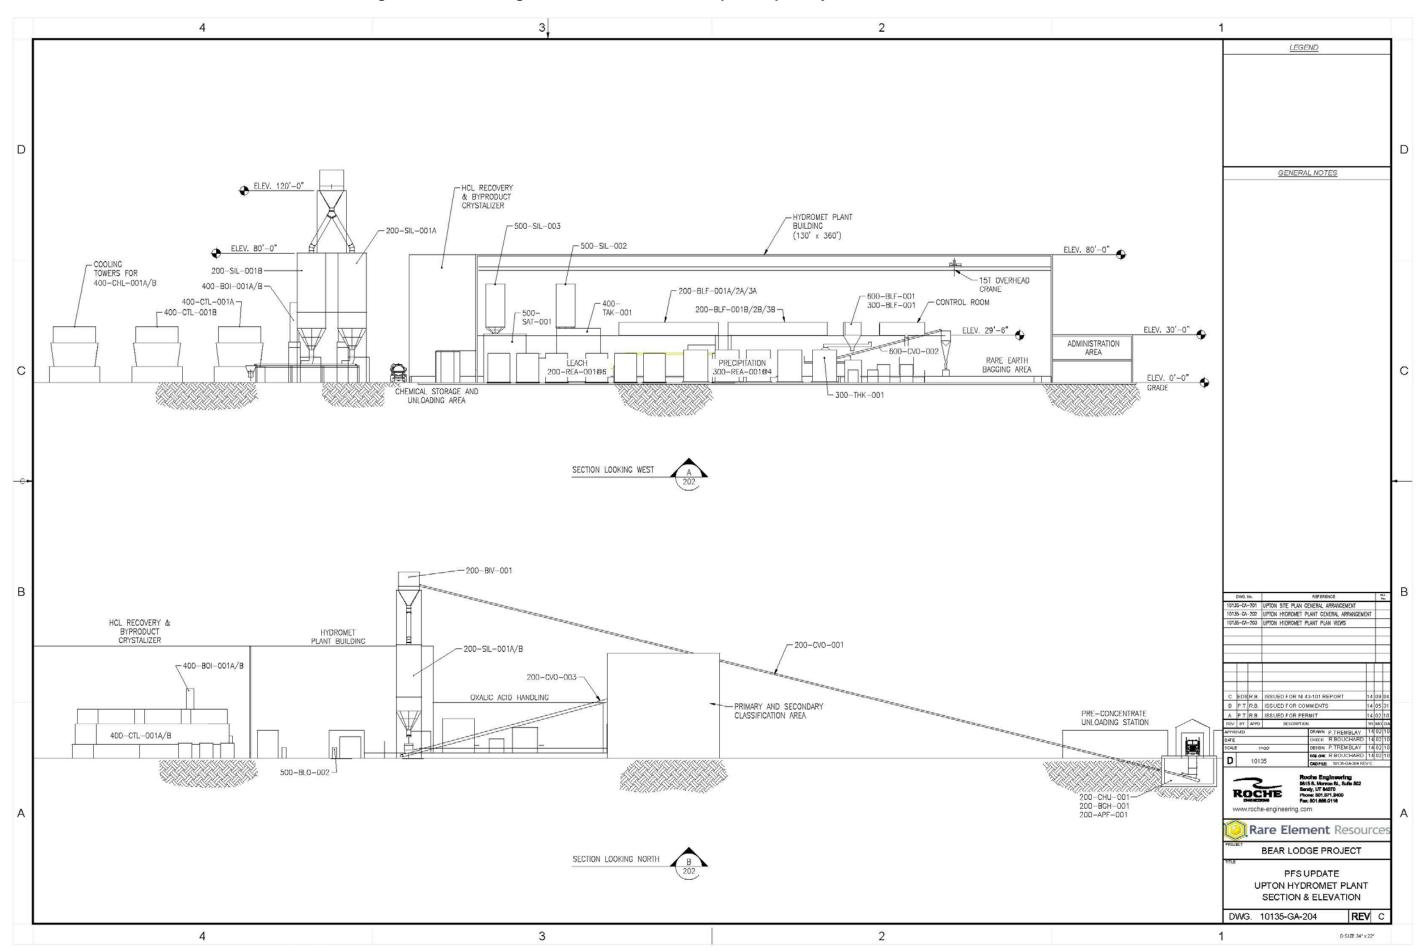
Drawing No. 10135-GA-2014 – PFS Update Upton Hydromet Plant Section & Elevation
